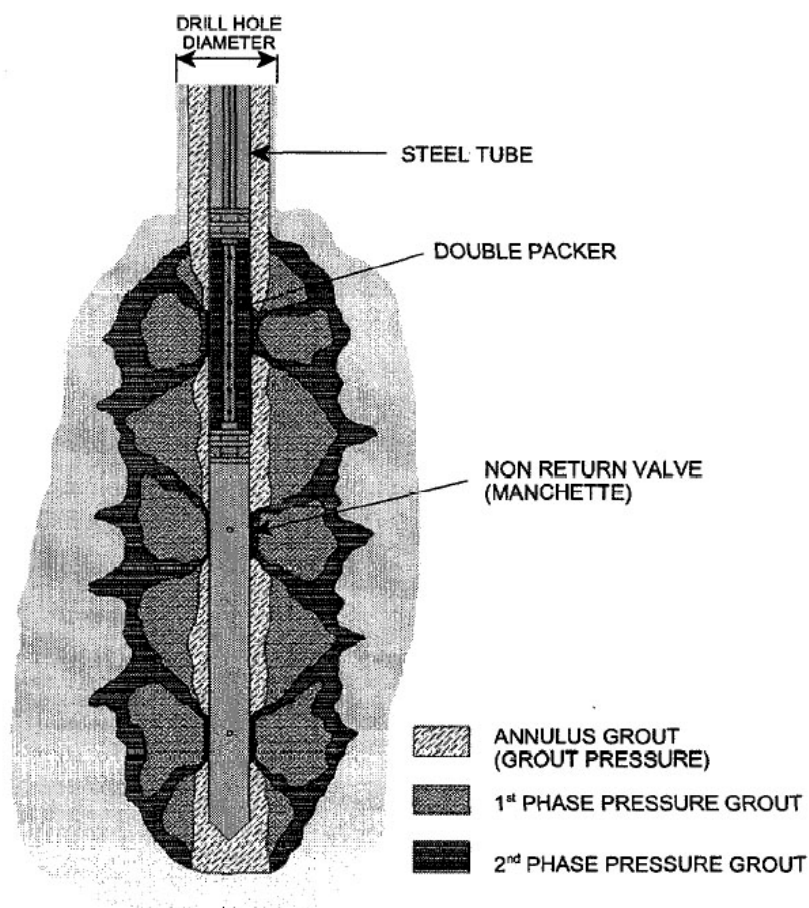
Use of Reinforcement Tube as a Tube á Manchette Post-Grouting
